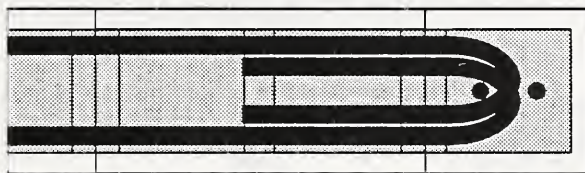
Grouting Pattern for Bond Beam Specimens
